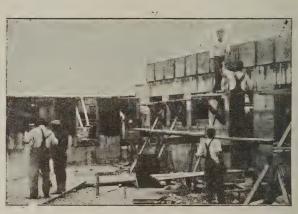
Pouring cinder concrete for the Overlook Colony houses
